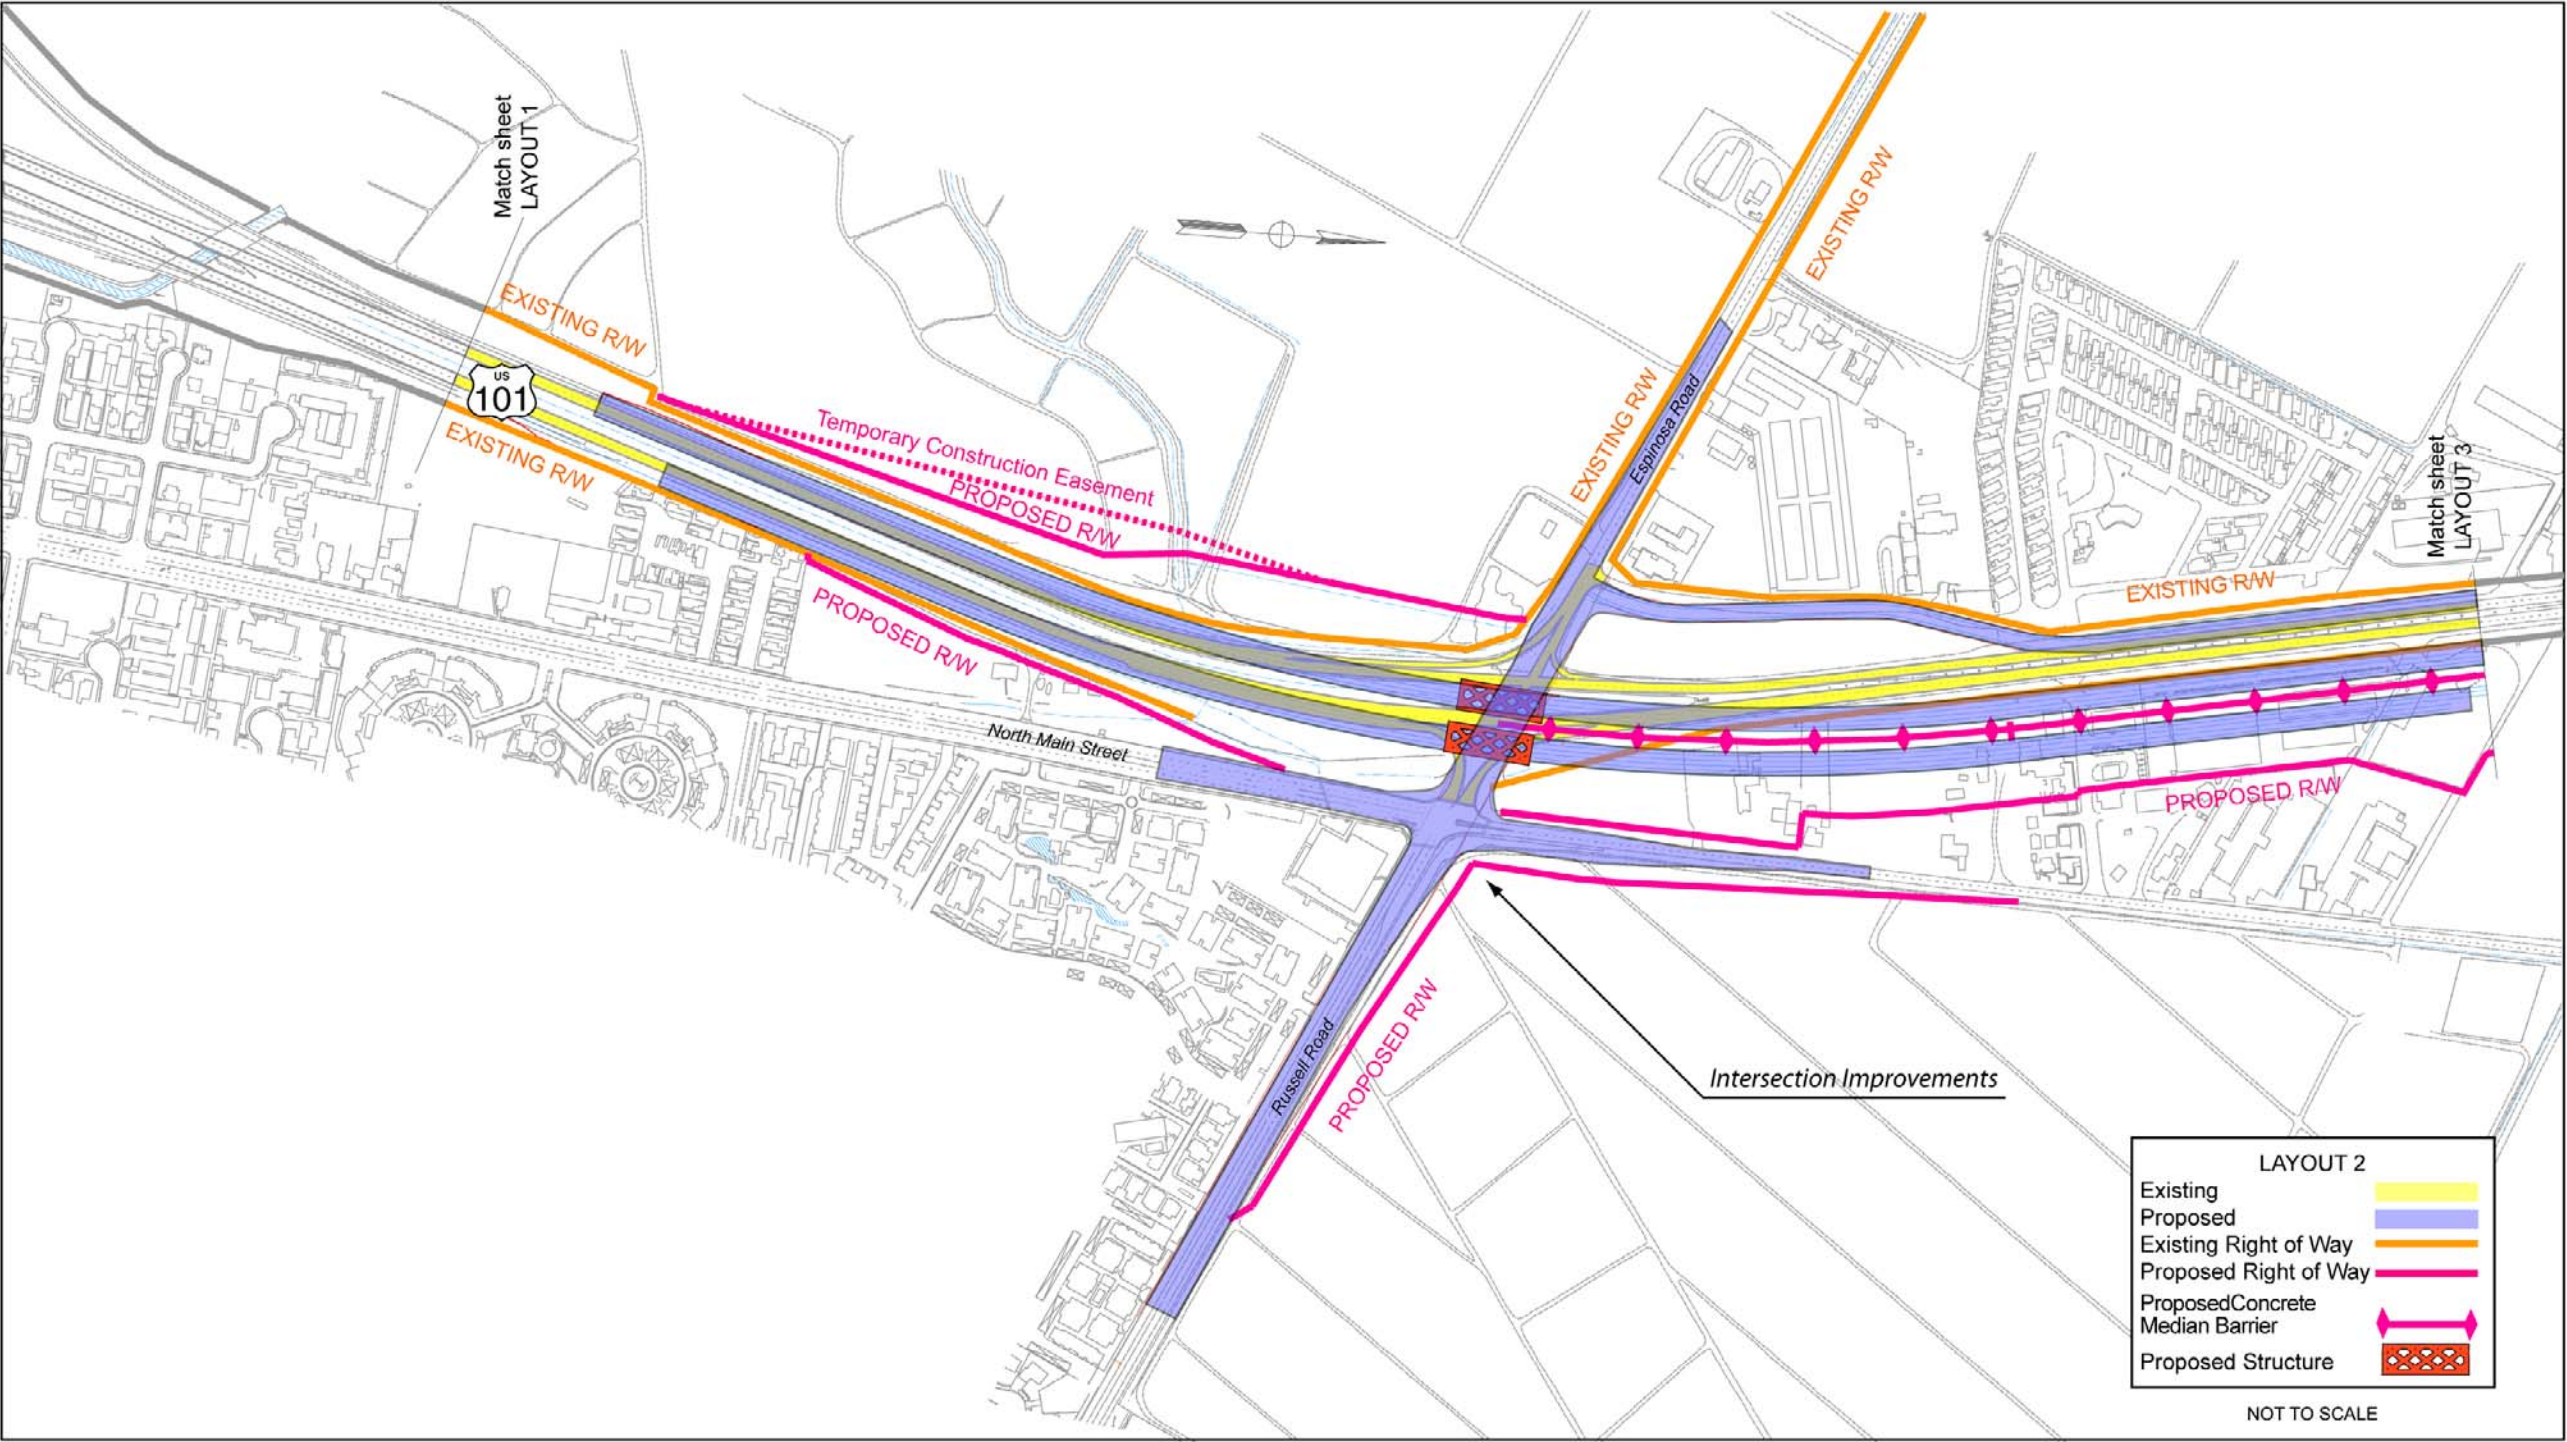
Build Alternative Design, Russell Road/Espinosa Road Location
